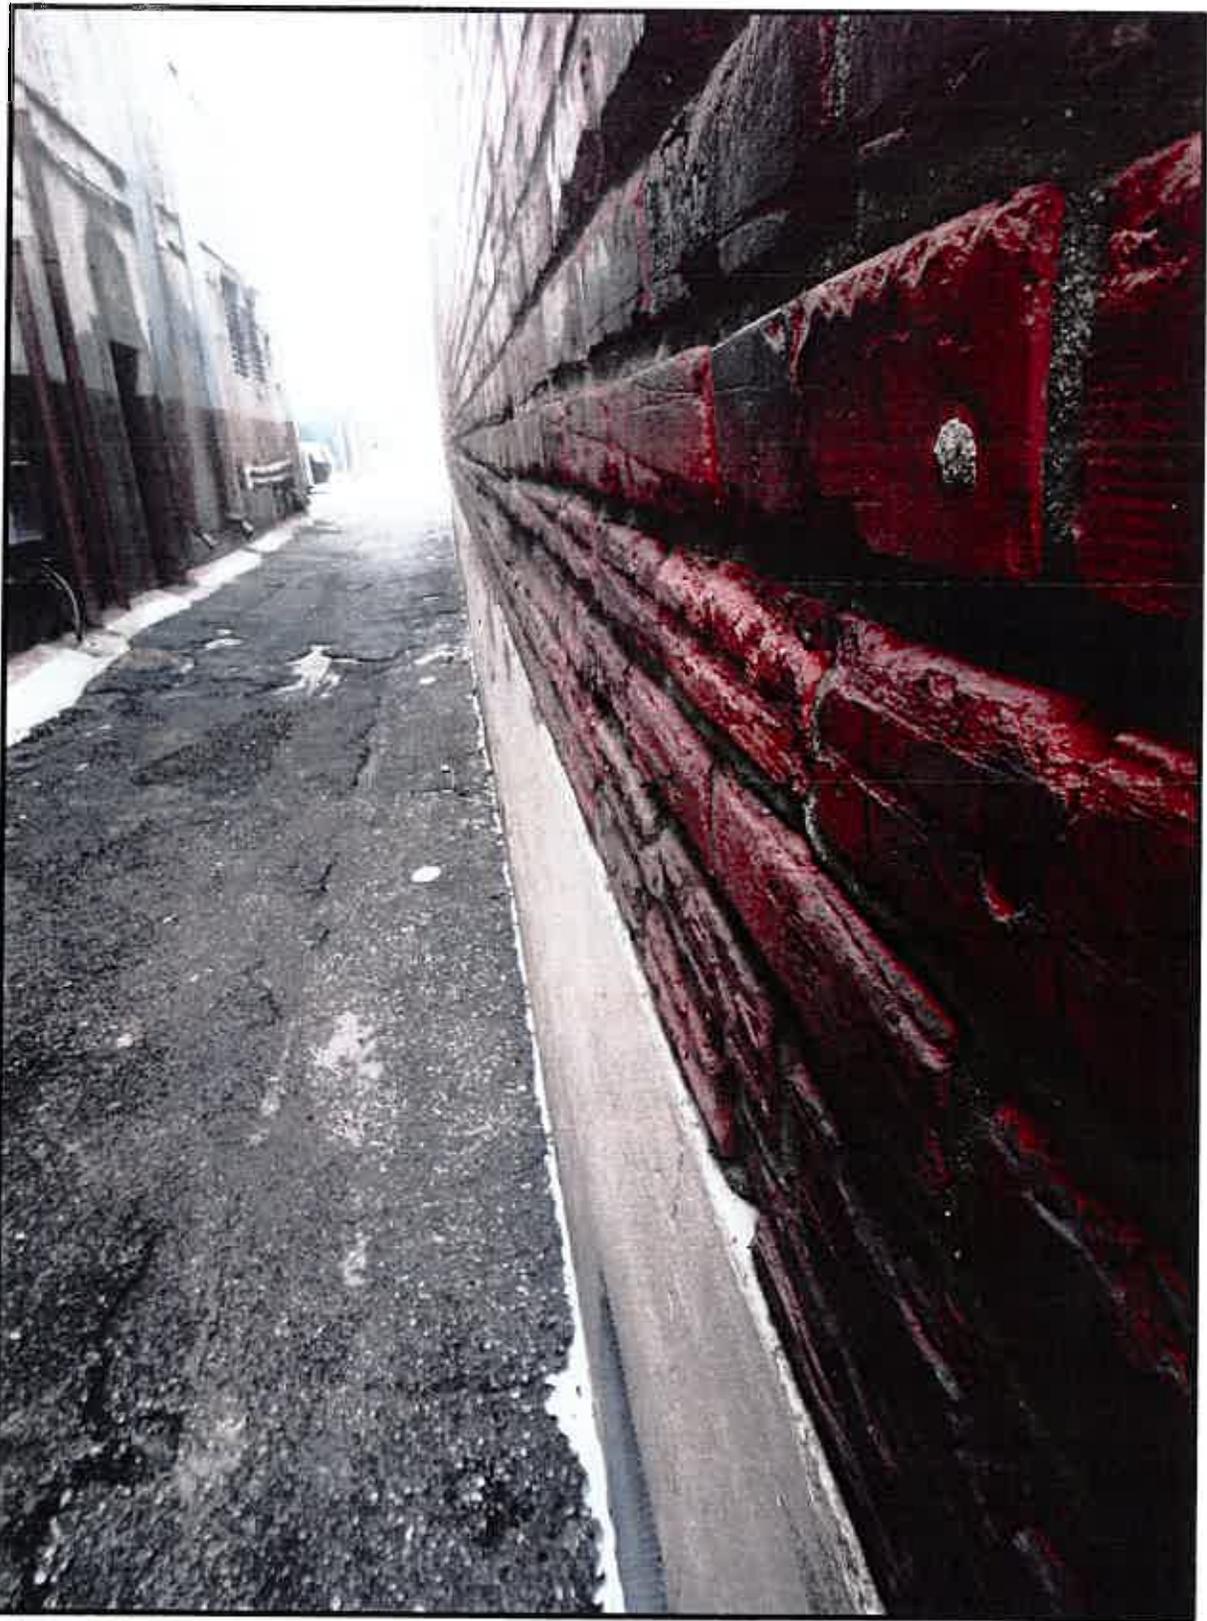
Damaged and spalling brick on the southwest elevation. Damage most likely caused by passing vehicles. Note the inappropriate use of the Portland cement mortar.
